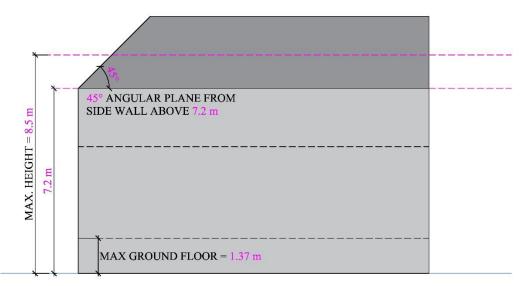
K.F8: Perpendicular Massing on Pitched Roof Building with No Front Porch
